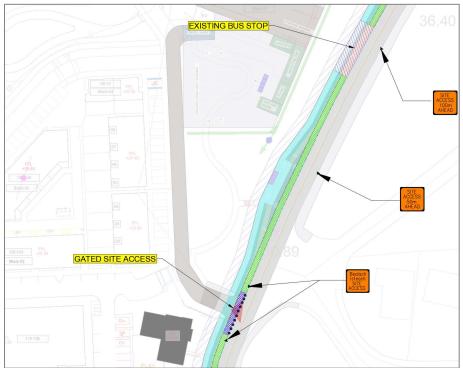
Traffic Management Plan at site entrance and public realm works (full details in Appendix A)
